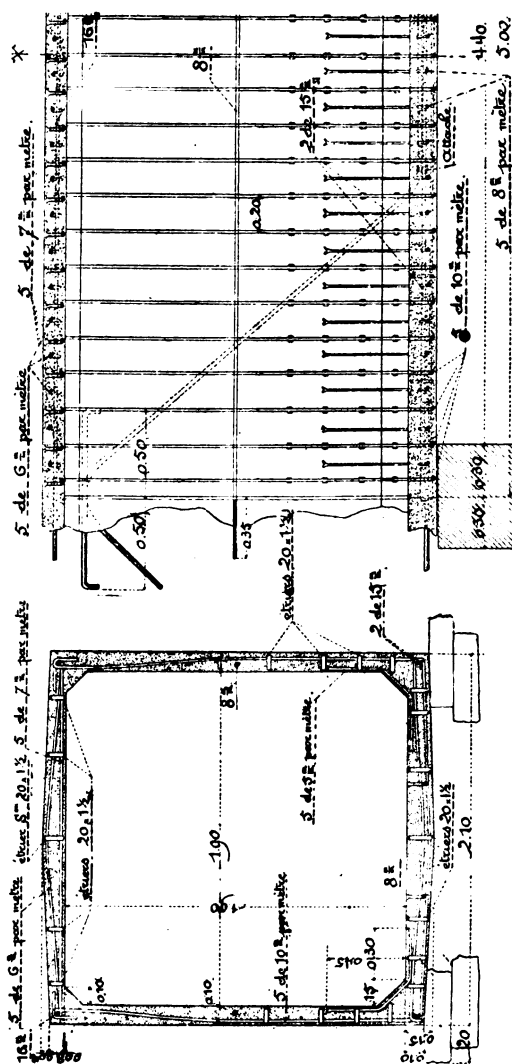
Reinforced Concrete Flume on Reinforced Concrete Trestle conveying the Water of the River Rhone to the new Simplon Tunnel.
